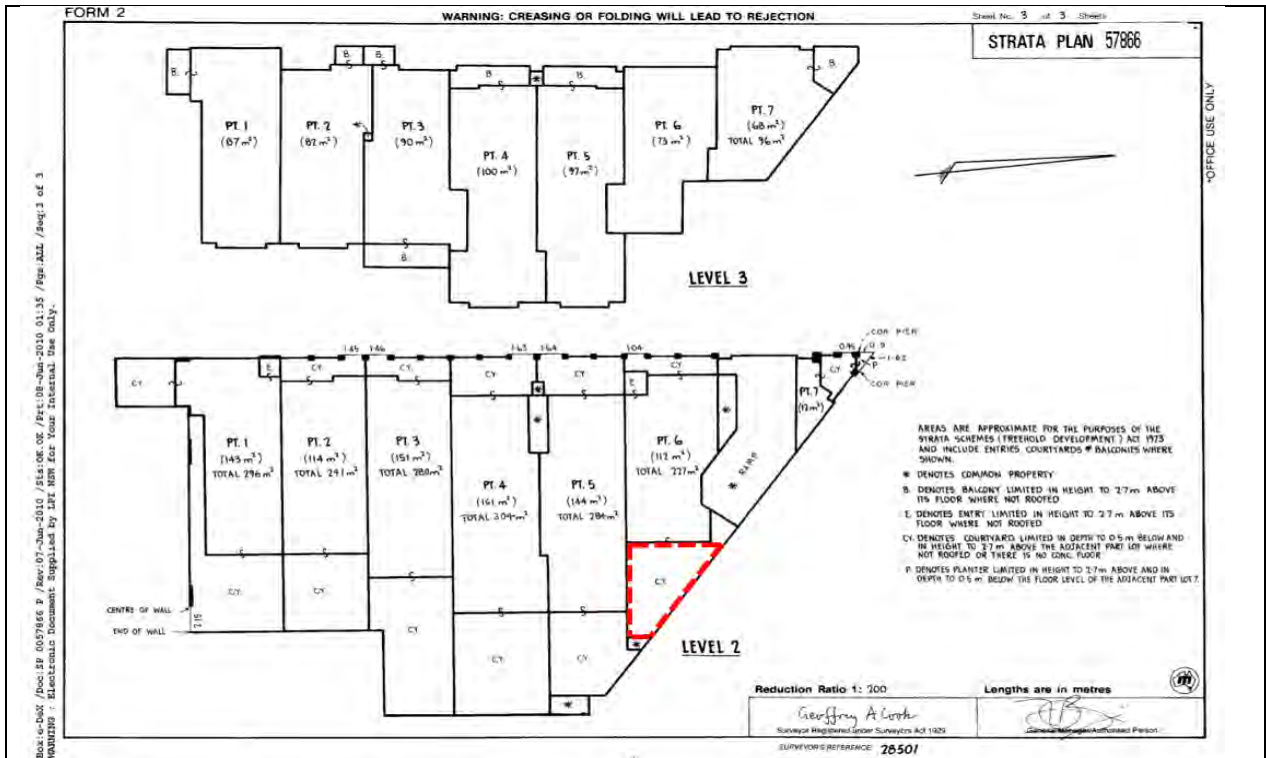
Strata Plan 57866 for 103-113 Blues Point Road (southern residential apartment). Area of private open space at rear of Lot 6 highlighted in red
